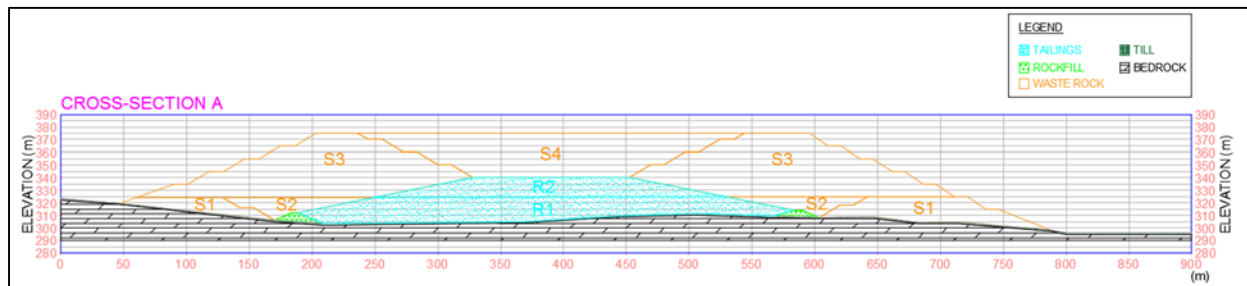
Cross-Section A of the Co-Disposal Stockpile
